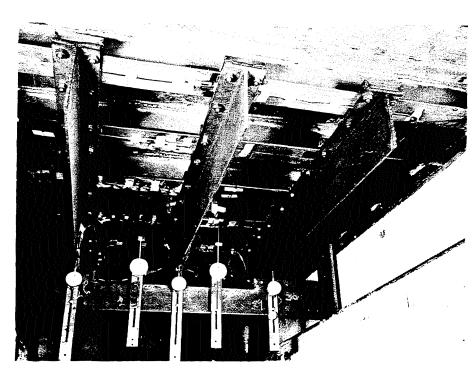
BOTTOM VIEW OF SPECIMEN V-3 SHOWING TRANSVERSE BEAMS CLAMPED AT QUARTER POINTS
